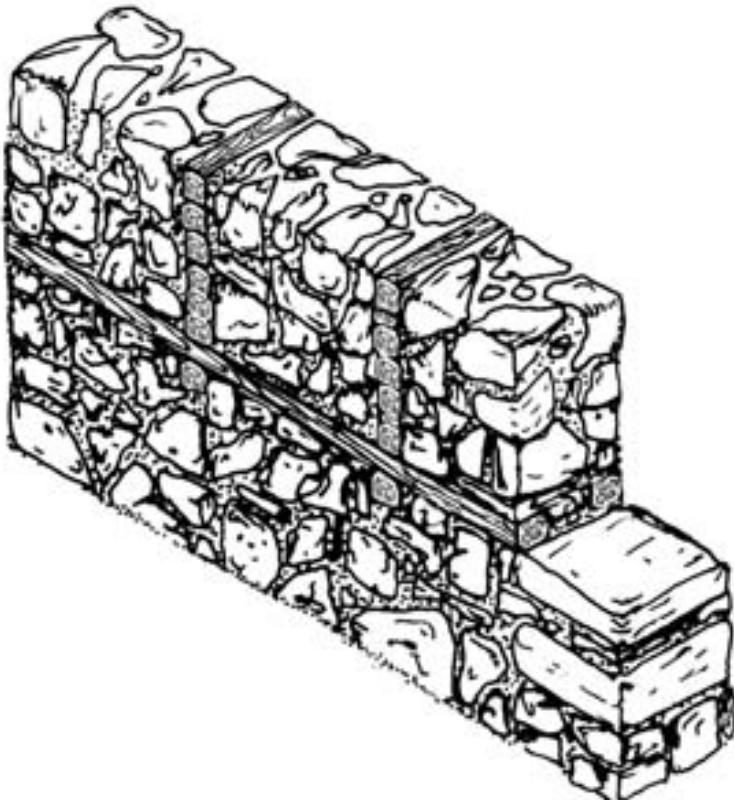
Timbered wall in Tsountas House, sketch by author
